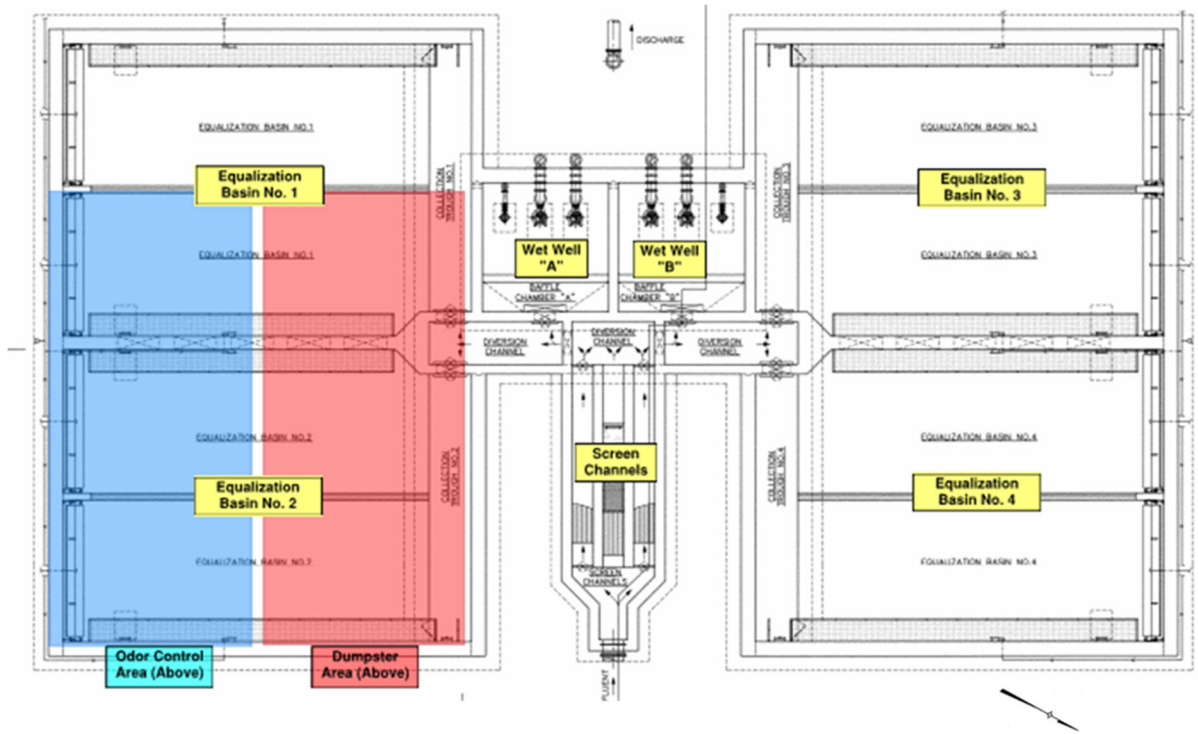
Pump Station 2 Floor Plan (Adapted from Record Plans)
